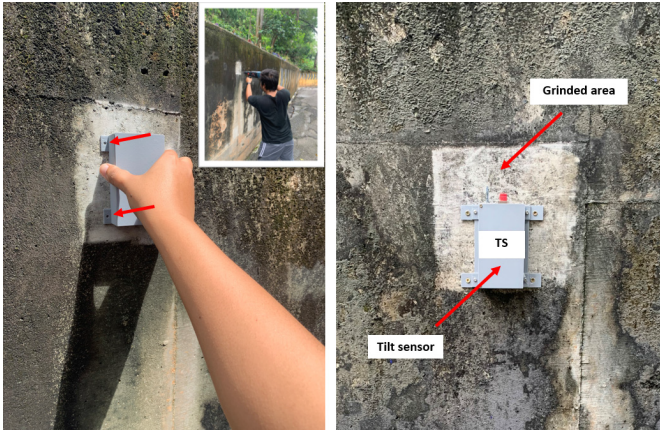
Installation of the surface-mounted tilt sensor onto the retaining wall.
